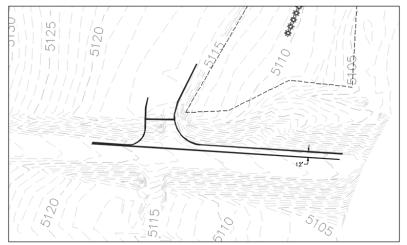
Conceptual sketch of proposed turn lane. Existing one foot contours are shown with labels every five feet. Proposed grading is not shown. The existing access is not shown: it is southeast of the pad. The turn lane and associated grading will be above the 5103' floodplain.
